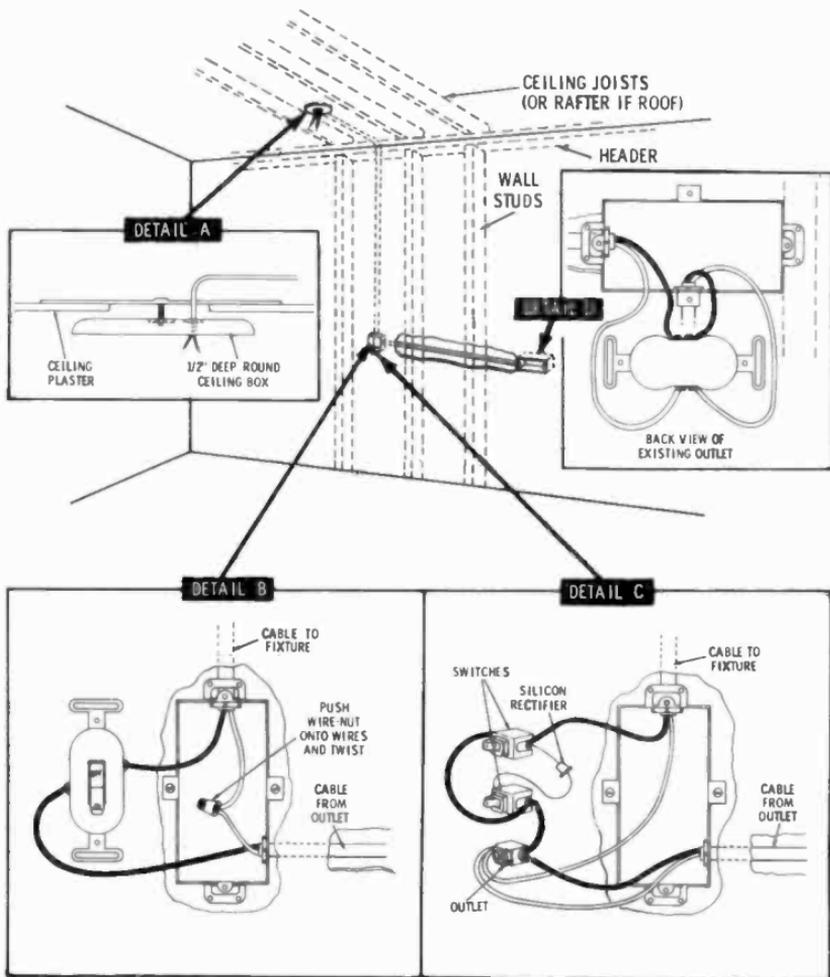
How to install a ceiling box and switch box for a drop-light ceiling fixture with concealed wiring. The cable must go through a hole in the "header." Detail A is a 1/2-inch deep ceiling box below the plaster and held in place by a long bar behind the plaster with a nipple at the center. Detail B shows the wiring of a single switch. Install the box as shown in the step-by-step illustrations shown previously. Detail C is an alternate switch arrangement, using "universal"-type devices. It provides an extra outlet and two switches: one is the "bright" switch, and the other, with a silicon rectifier in series, is a "dim" switch. Detail D shows how to make a parallel connection to the existing outlet.
